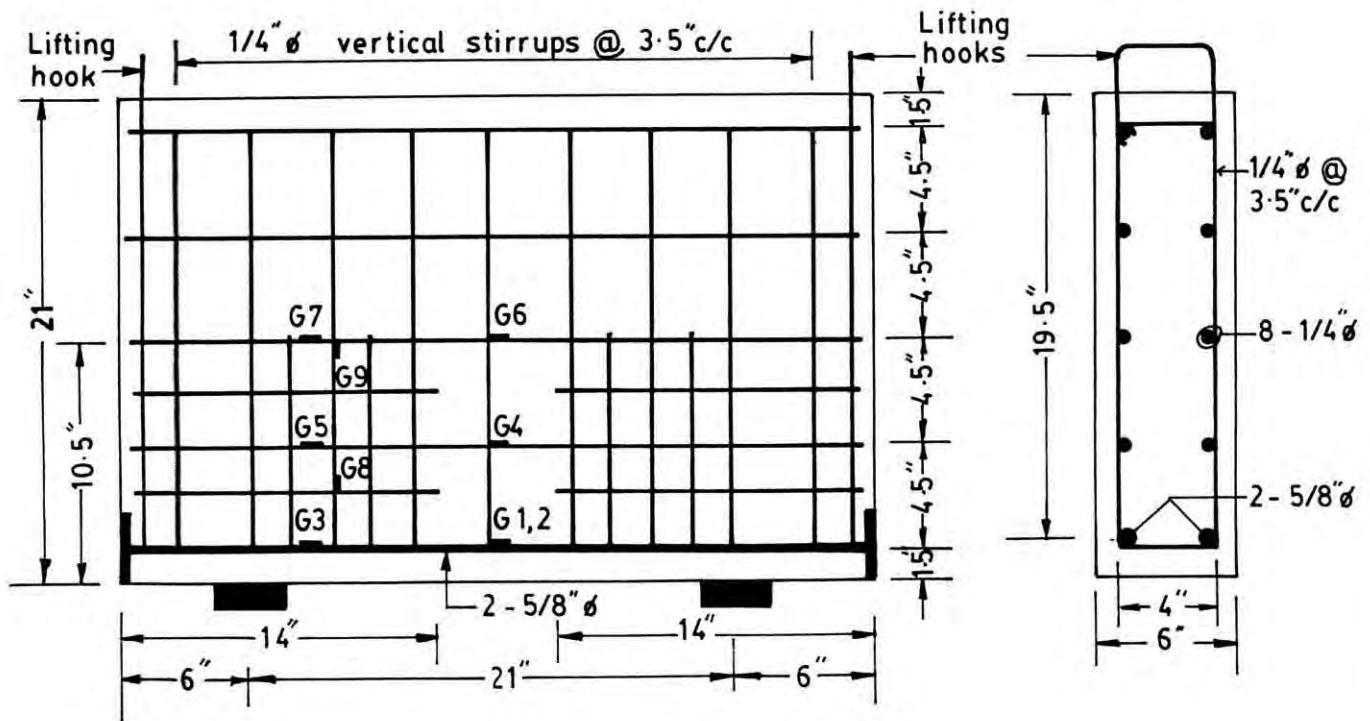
Reinforcement arrangement of beam DB-P6
